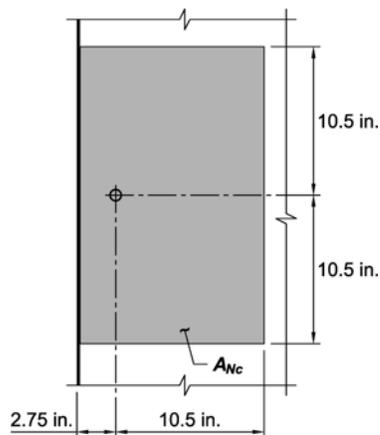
Example 5: Projected concrete failure area A_{Nc} .
